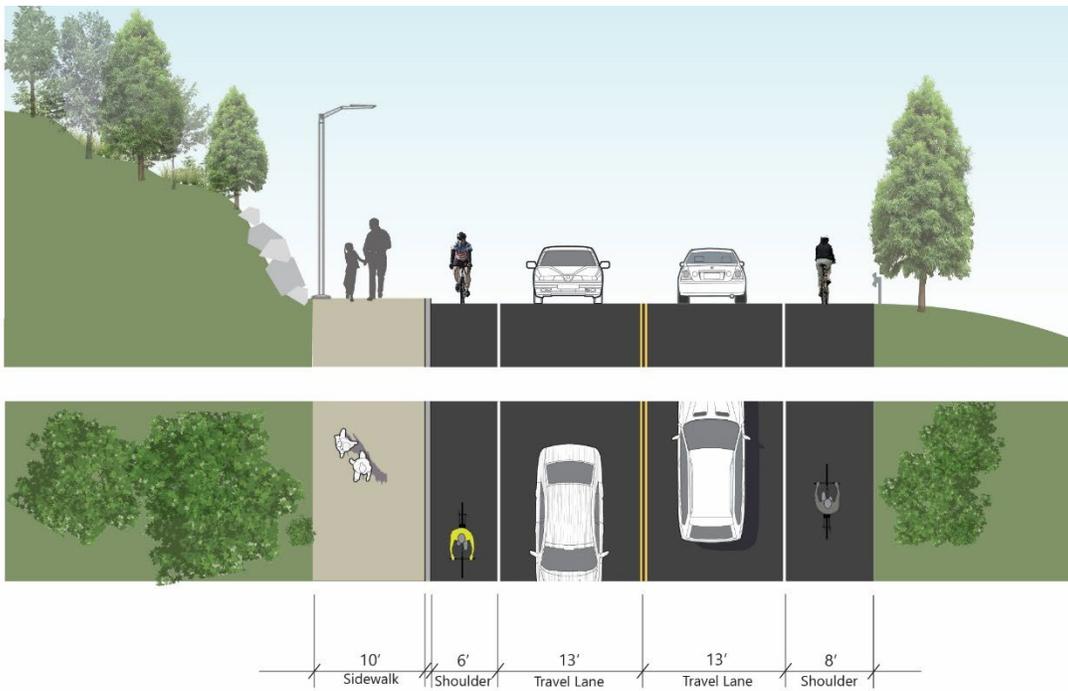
Section F-2: Proposed Fellsway West (north of Sheepfold), facing north (DRAFT CONCEPT)
